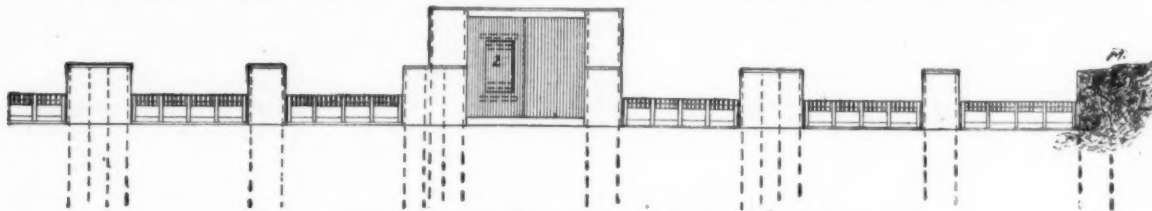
FRONT ELEVATION OF BARRICADE SHOWN IN FIG. 24.
